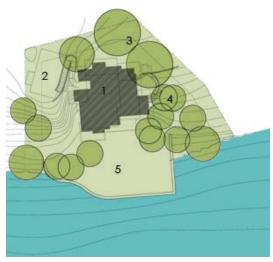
Site Plan - 1. House 2. Parking 3. Garden 4. Garden 5. Front Lawn
